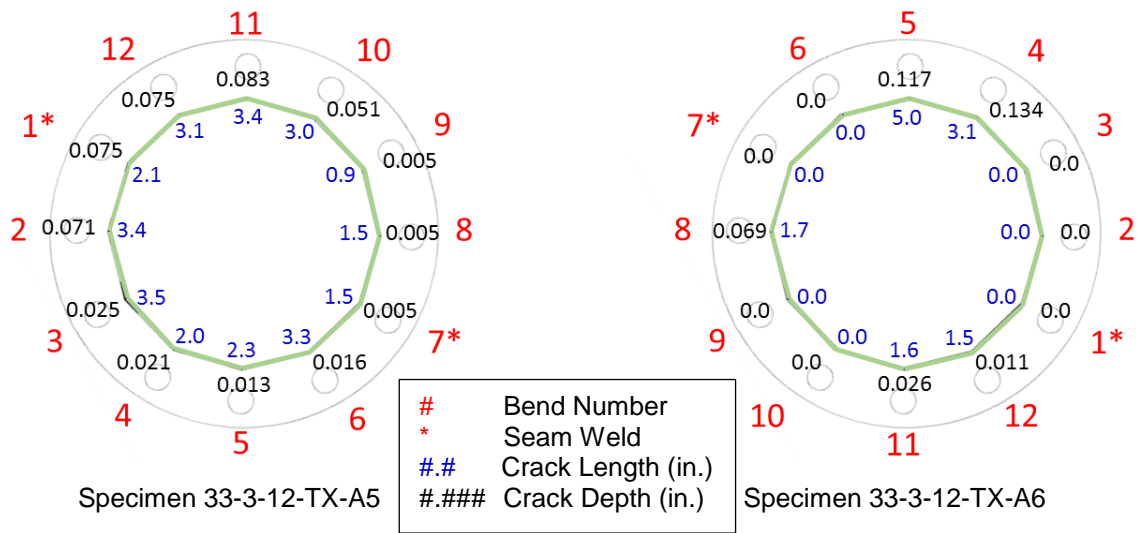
Specimens 33-3-12-TX-A5 and 33-3-12-TX-A6: Cracks after 54.7 Million Fatigue Cycles
